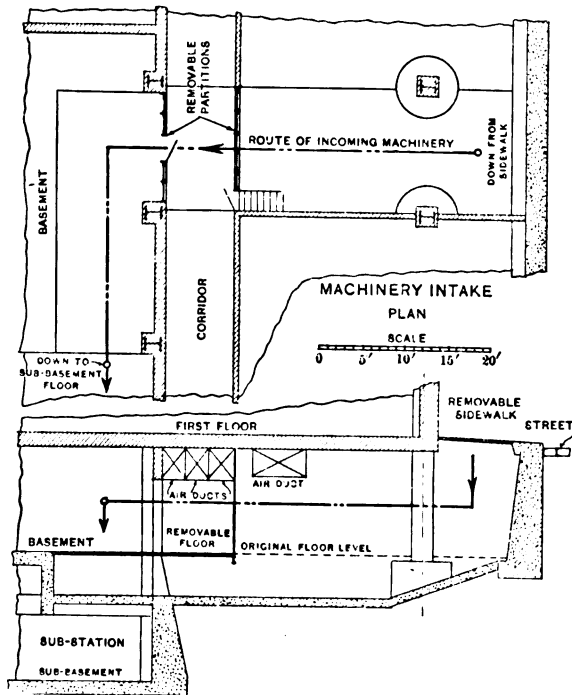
PLAN AND SECTIONAL ELEVATION OF MACHINERY INTAKE
